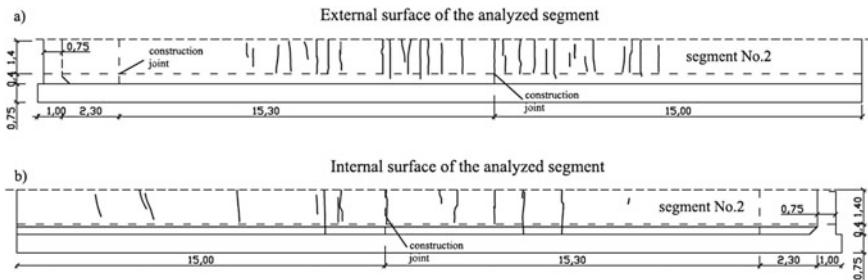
Layout of cracks and their widths on the a) outside and b) inside segment surfaces
